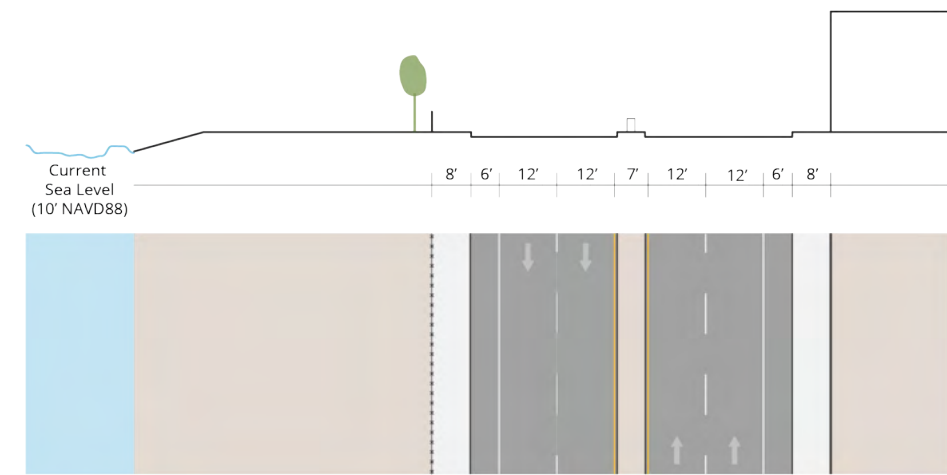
EXISTING SECTION OF ROUTE 1A CORRIDOR AT ADDISON STREET
